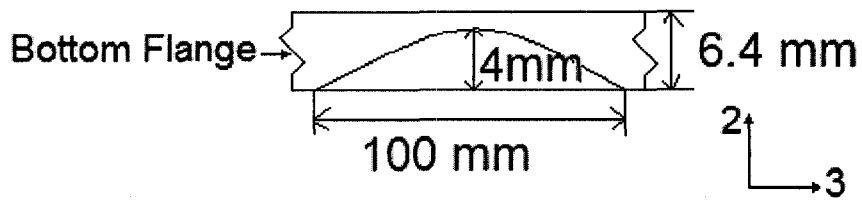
Two-dimensional view of the corrosion at the outer edge of the flange
